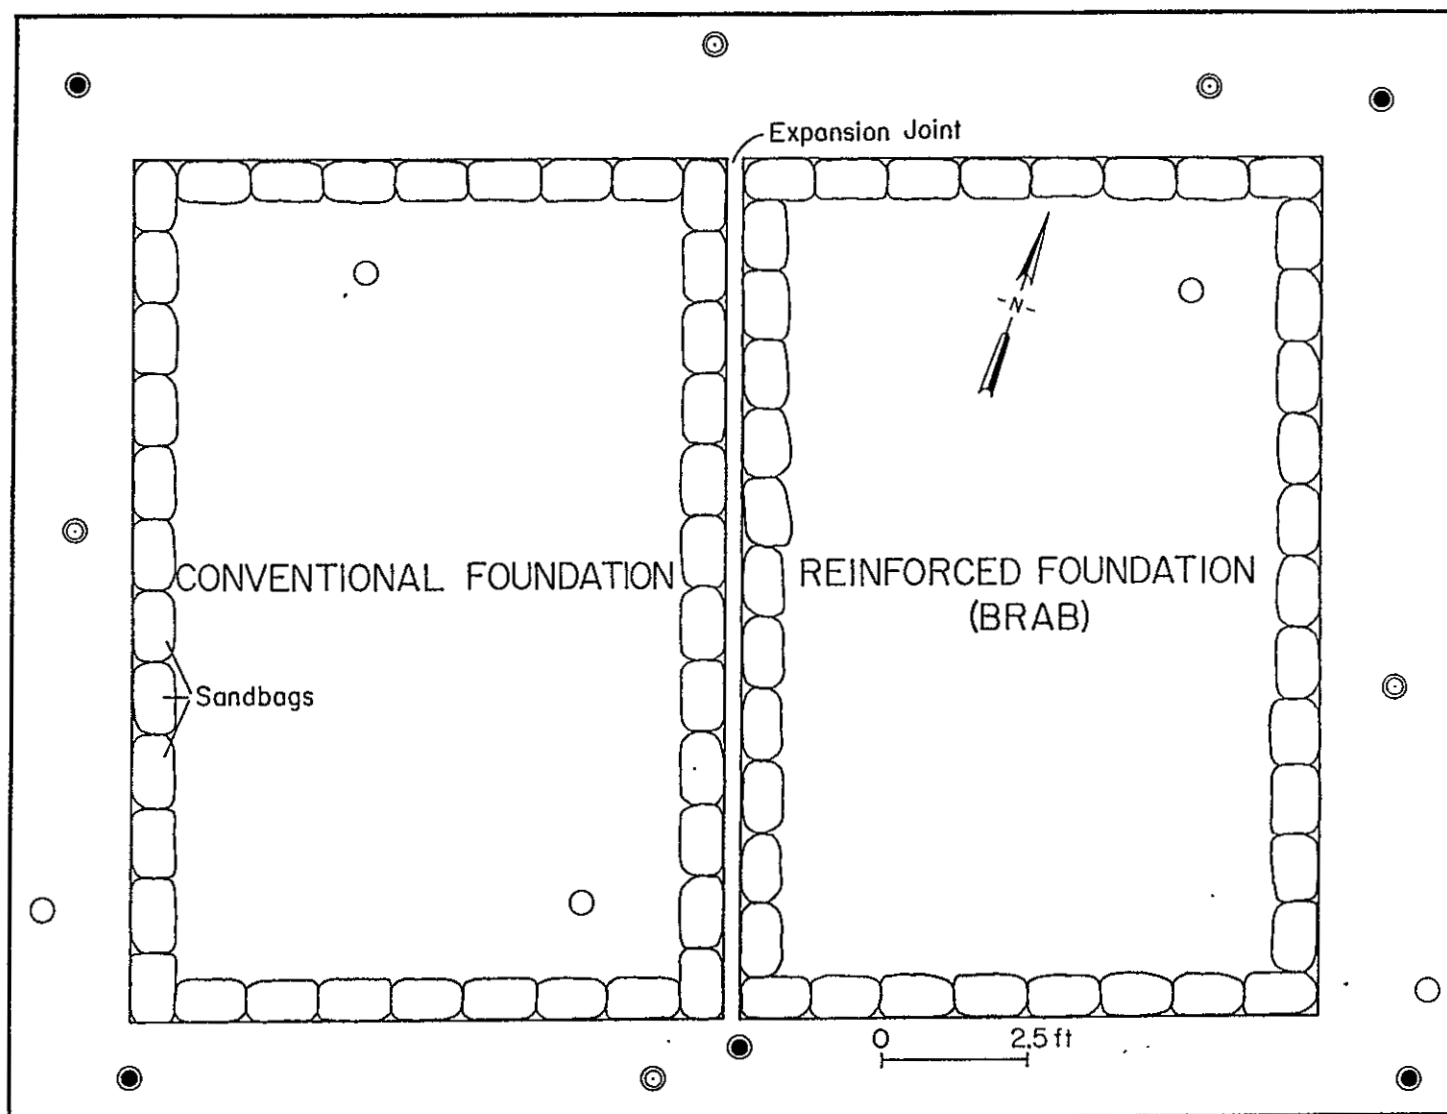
Map of GGSS-Area 4 (concrete foundations) showing well locations.
